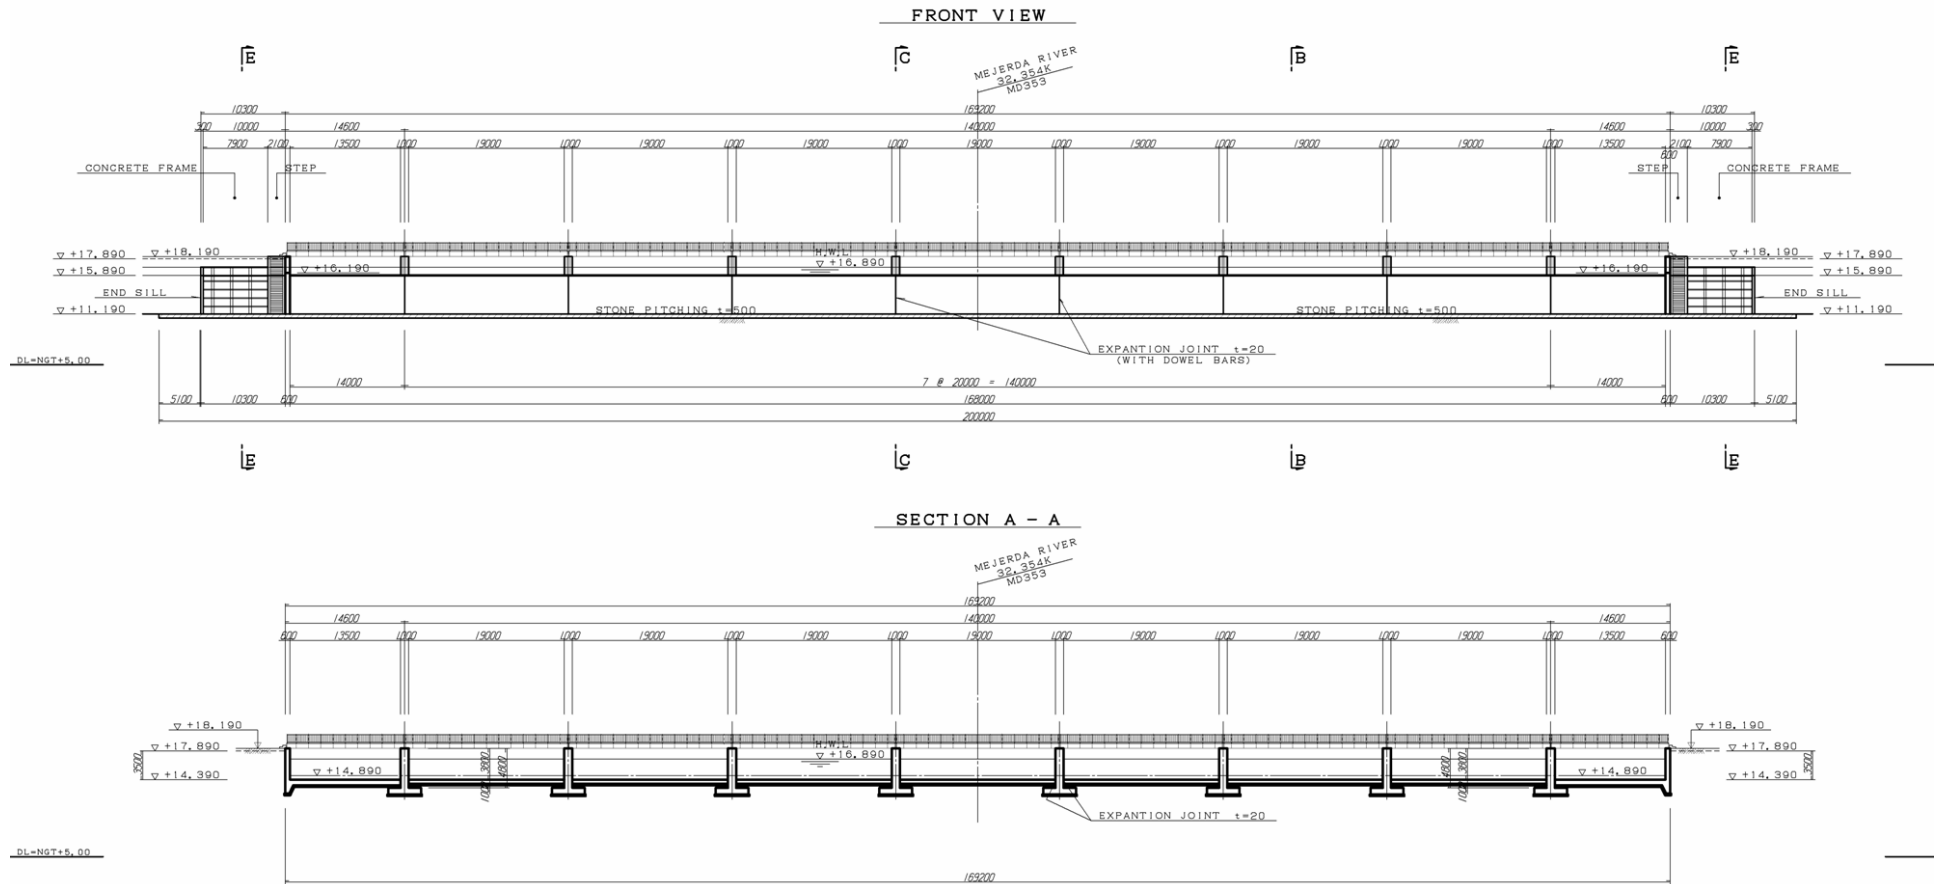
Elevation and A-A Cross Section Drawing of Split Flow Weir to Flood Control Basin
